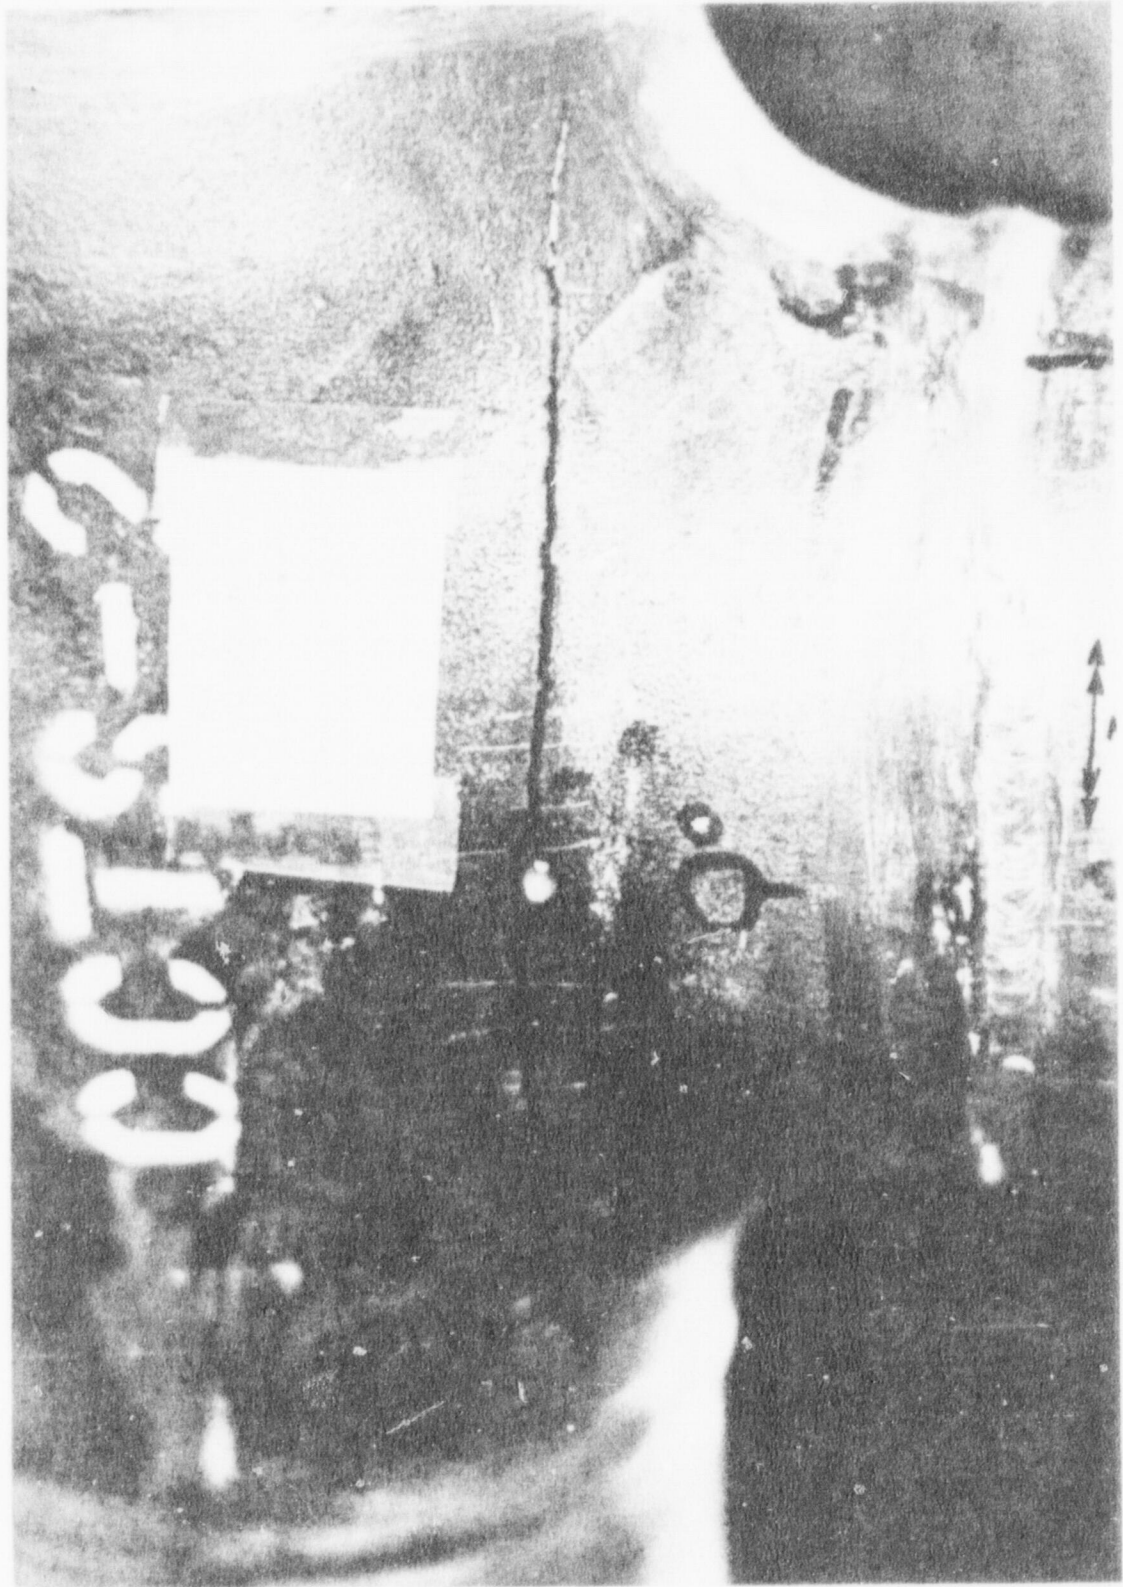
FINAL FRACTURE GEOMETRY, SPECIMEN NO. CCTS-2. VIEW SHOWS BOTTOM SIDE OF TEE (37)
